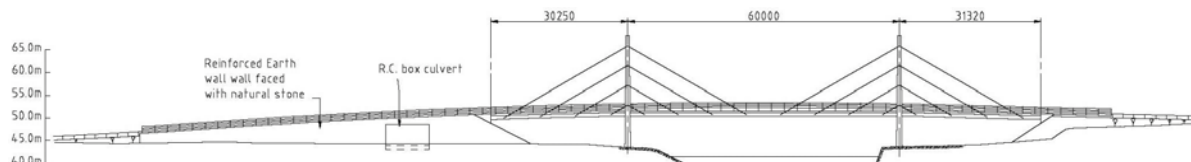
Proposed River Nore bridge - Southern Elevation
